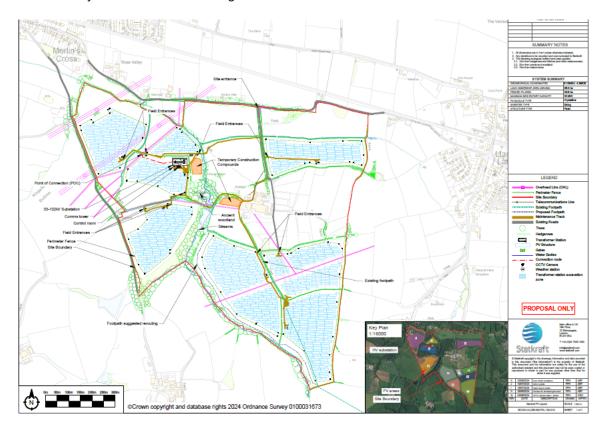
Site Layout Plan (in full at the end of this NTS) $\,$
